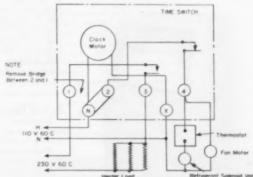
ELECTRIC HEAT DEFROST wiring diagram shows a single pole double pole switch arrangement in which one contact controls the compressor or compressor motor starter and the other contact controls the heater.
